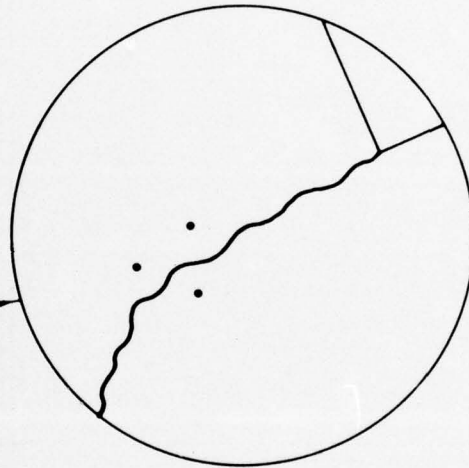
Crack and gage locations for strain instrumentation in the river wall gate bay monolith, R-12.
